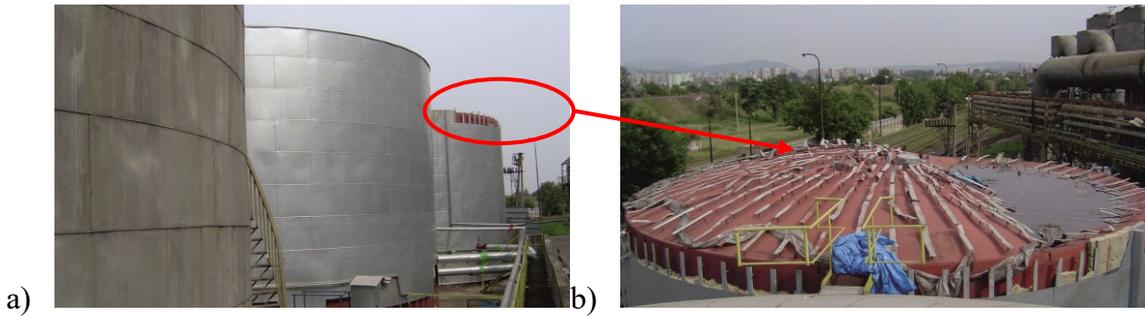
a) View of storage tanks, b) collapsed roof of the storage tank
